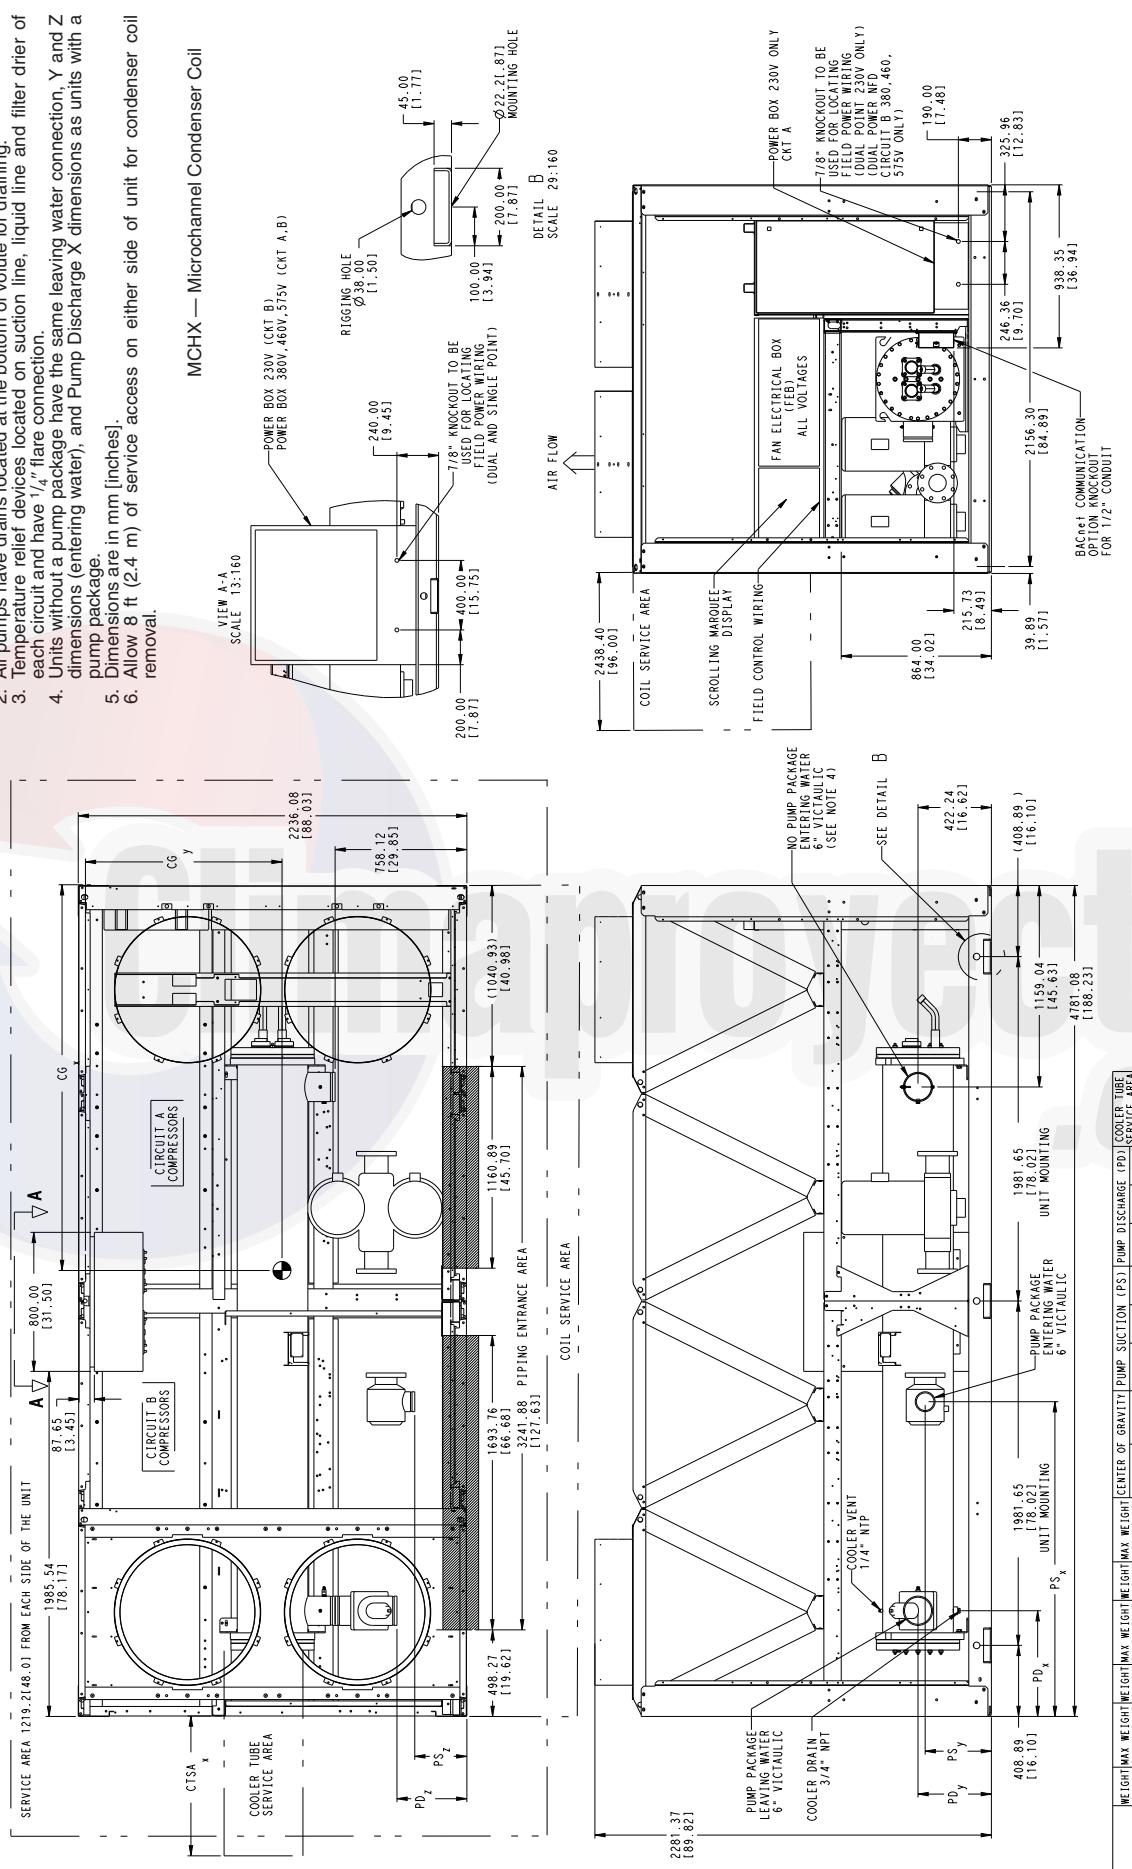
30RB150 Air-Cooled Chiller Dimensions
